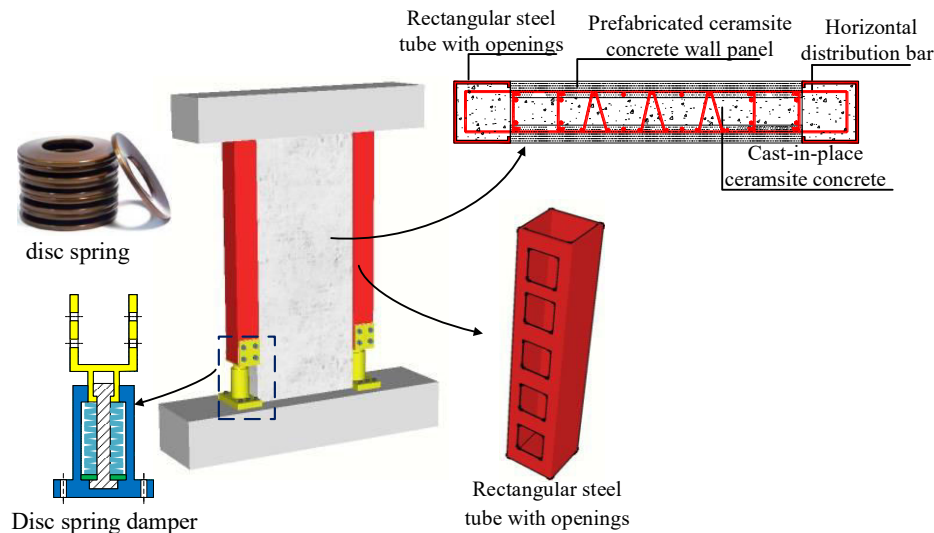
The steel - ceramsite concrete composite shear wall with replaceable foot components
